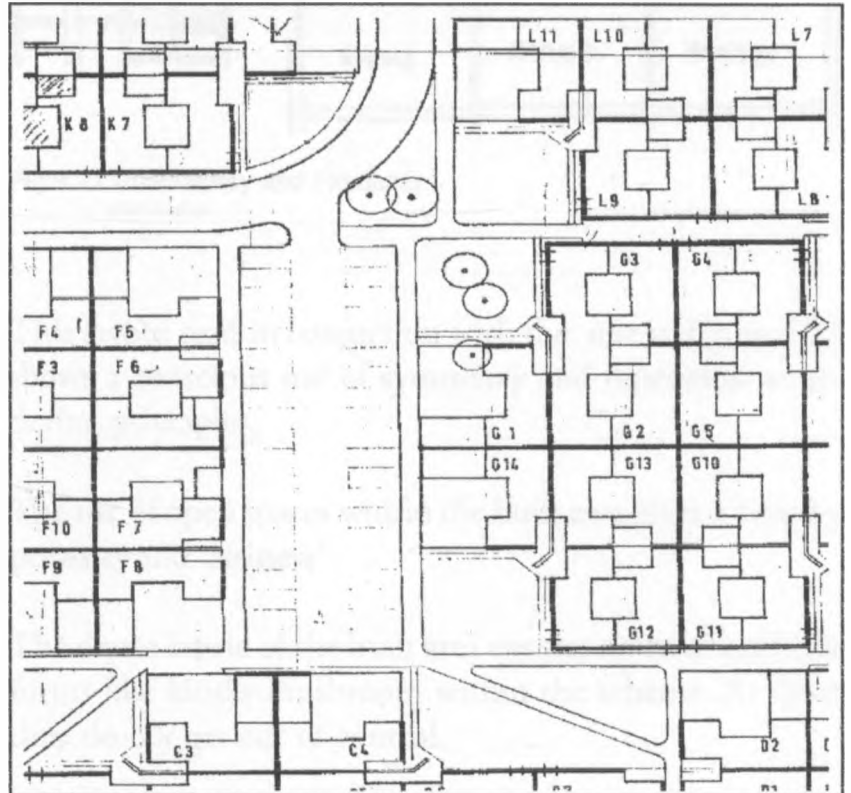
Layout for Fort Jesus shows minimised cost of construction due to shared party walls and services.
